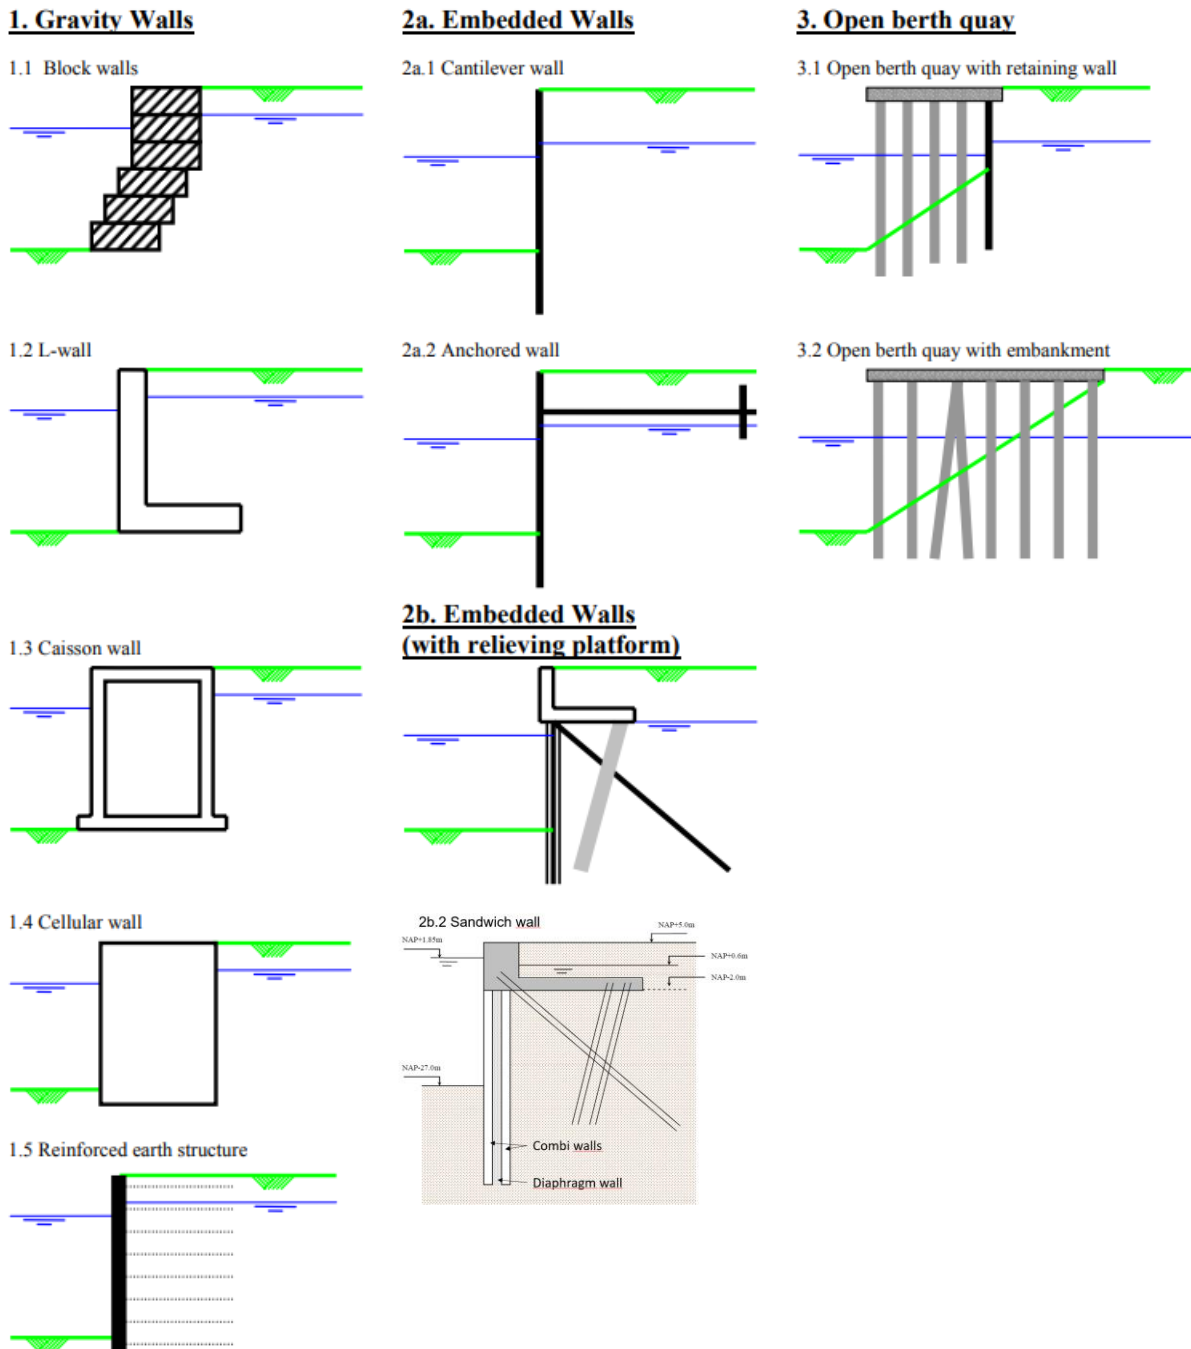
Overview of quay wall types separated in gravity, embedded, and open berth quay walls (adapted from Meijer, 2006).
